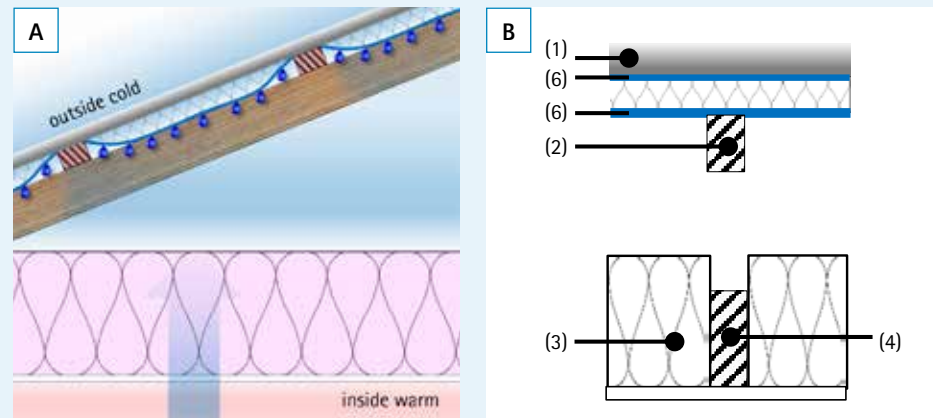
A: There are now two condensing surfaces; the foil and the sheet metal. B: Blanket compressed under metal roof: (1) Metal sheet roof, (2) Truss top chord, (3) Bulk insulation, (4) Truss, (5) Foil Vapour Barrier, (6) Condensing plane
